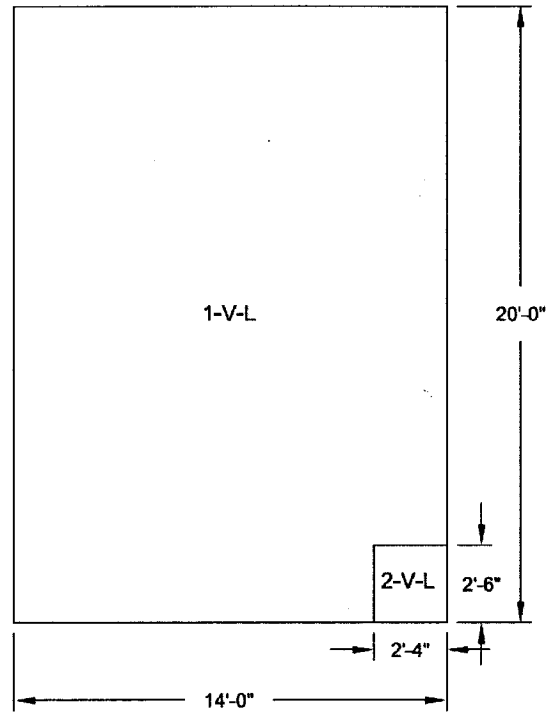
H.6-175 Wall 9 Looking From Outside Horizontal Reinforcement Zones
